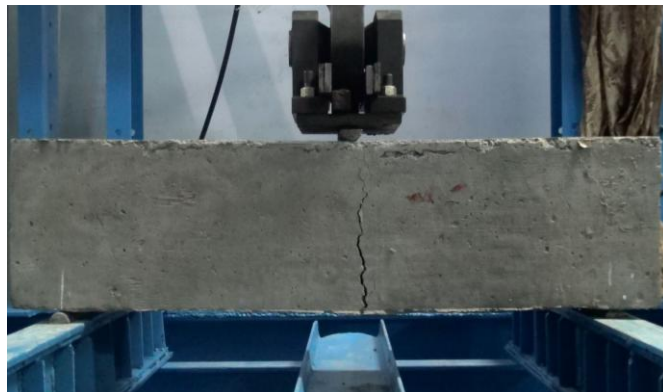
Crack pattern for beam with e-waste as reinforcement
